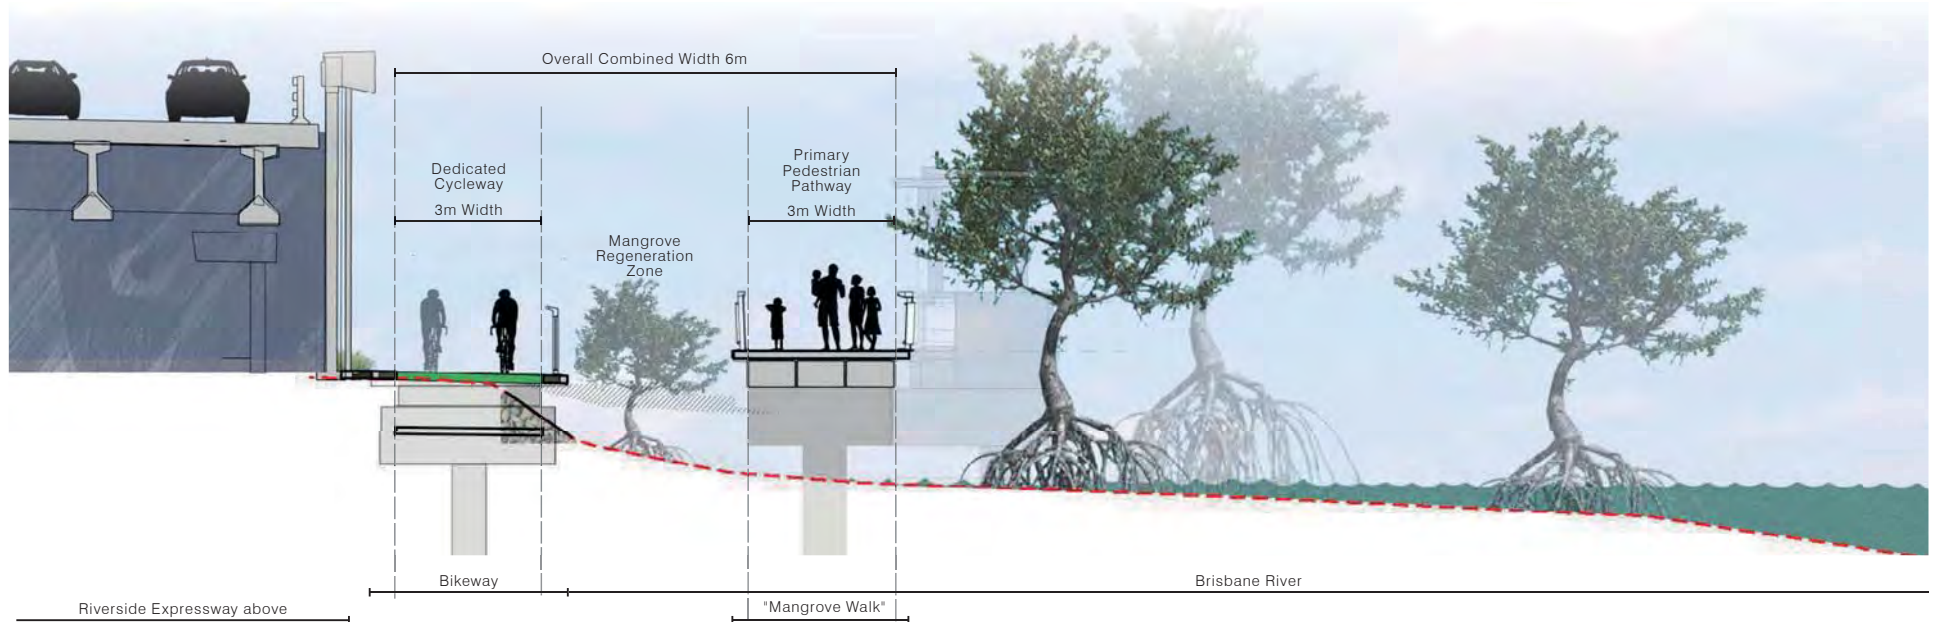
Goodwill Extension Type 1 Sectional Elevation (Not to scale)
